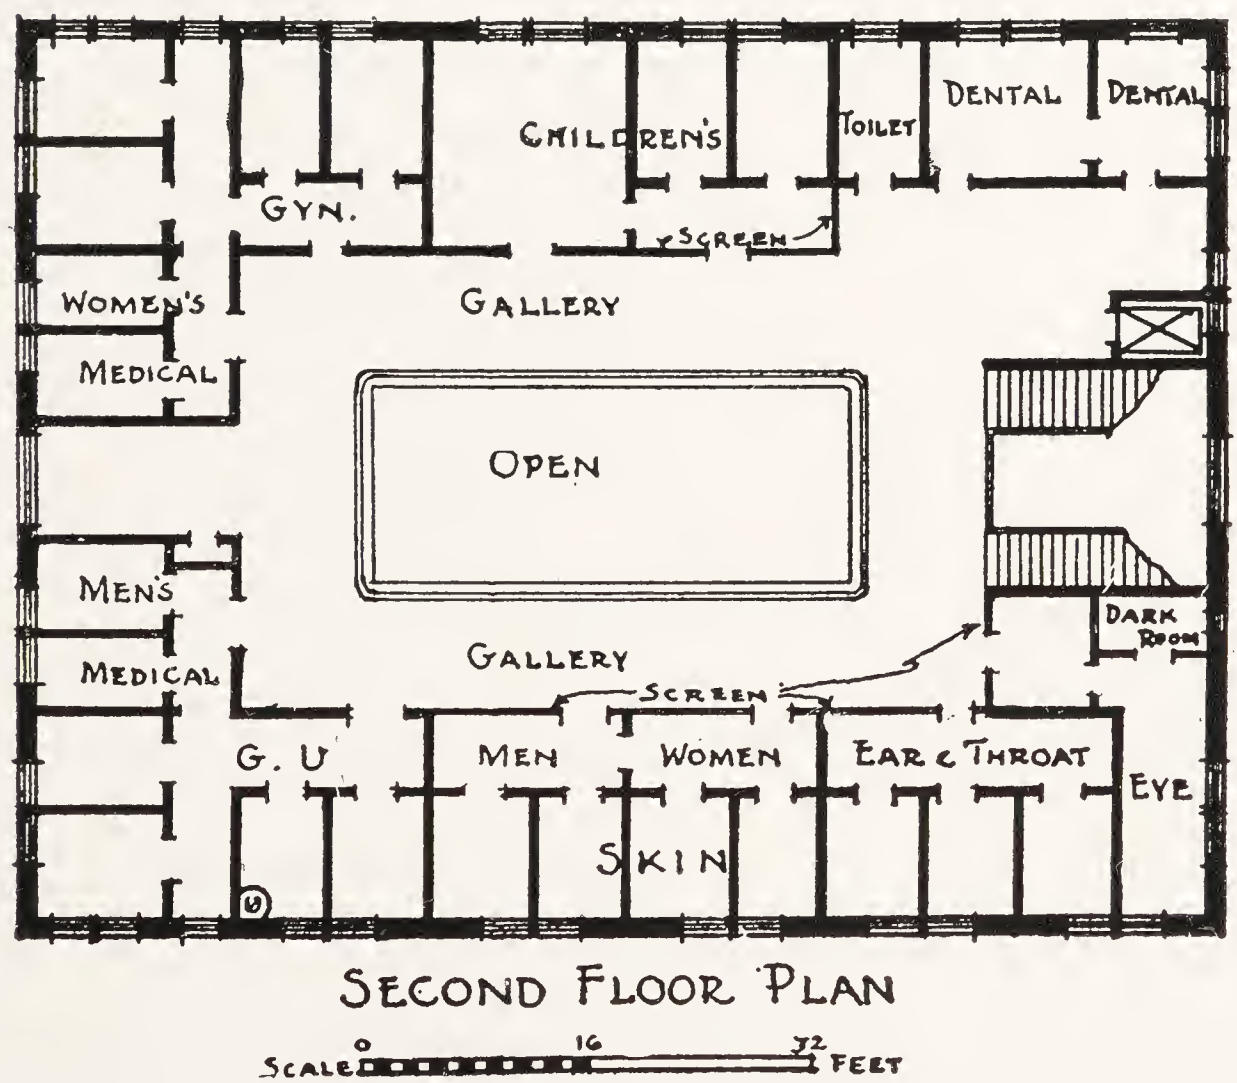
RECTANGULAR BUILDING FOR OUT-PATIENT DEPARTMENT
